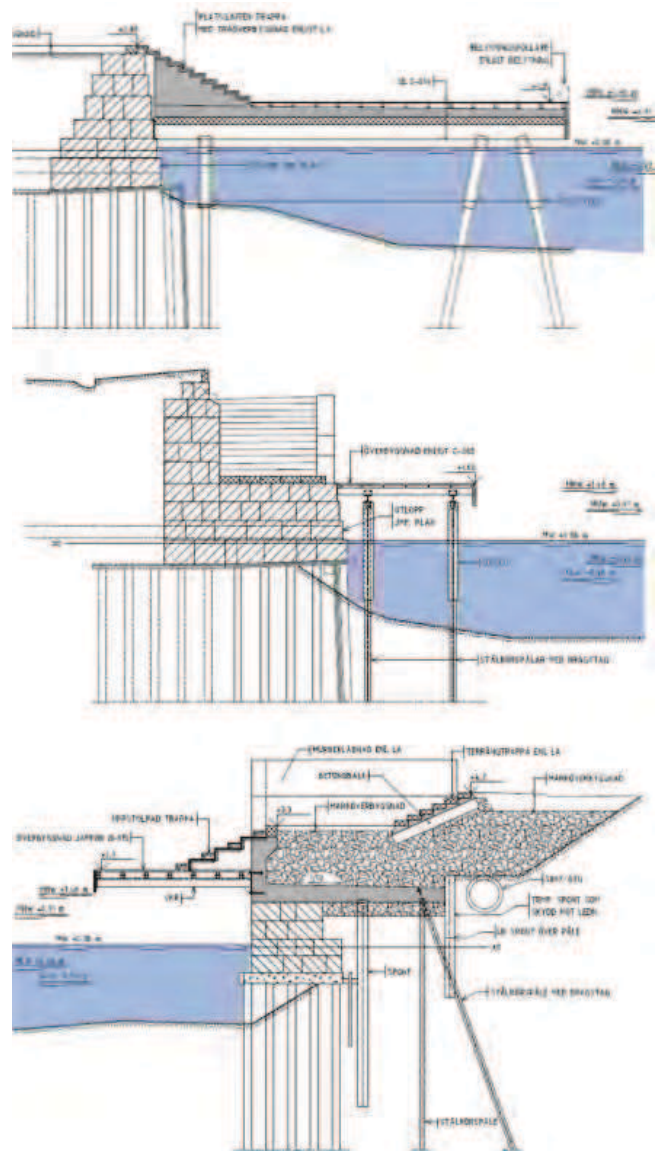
Three different pier types. Top: concrete slab founded on piles (pier 1). Middle: steel structures founded on piles (pier 3, 6, 7, 8 and 9). Bottom: suspended steel structures without contact with the riverbed (pier 2, 4 and 5).
